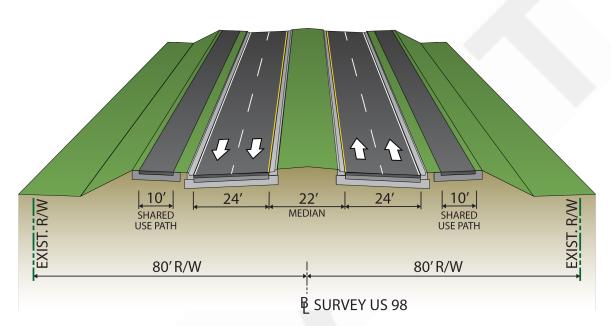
Proposed US 98 C3R (Suburban) Typical Section
